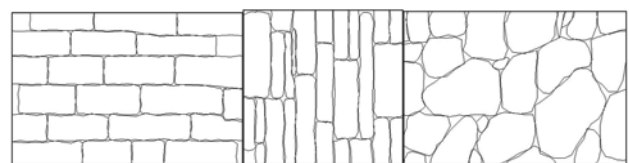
Different wall styles found in the United Kingdom: horizontal construction, vertical construction, random construction.
